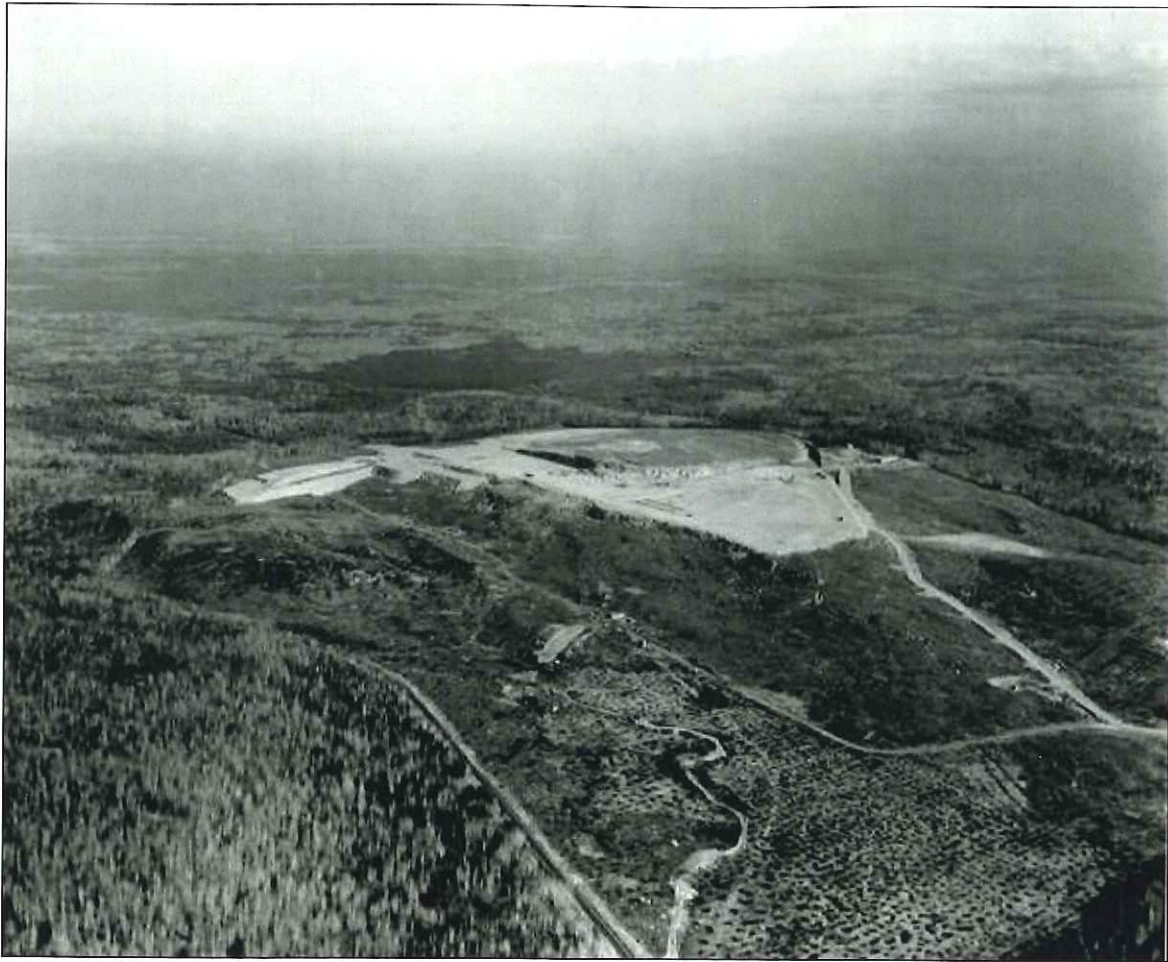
Erie Mining Company site after excavation began, looking northeast, ca. 1954.
